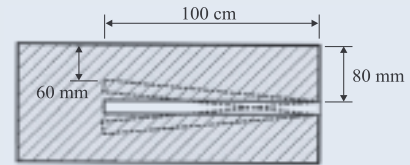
Overlaps in fastening of reinforcement in slabs and beams built onto an existing structure
